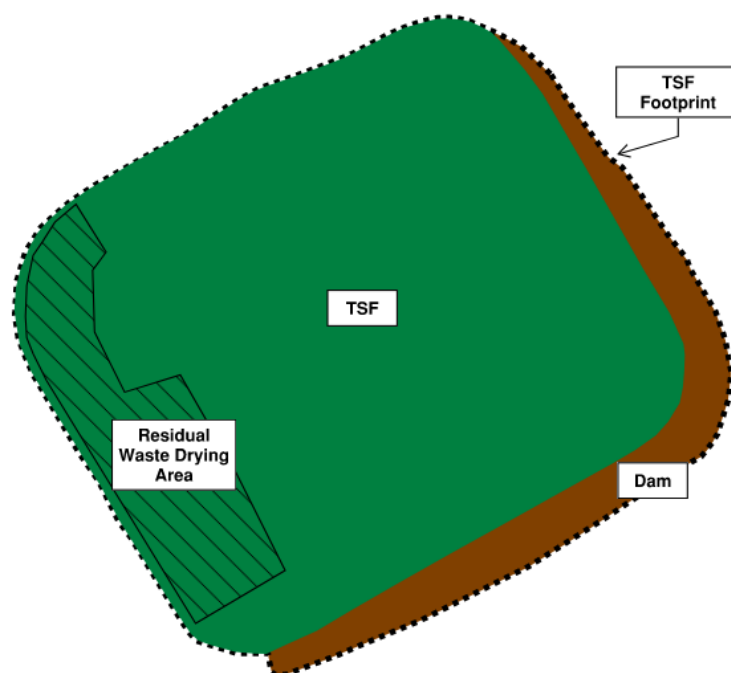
Configuration of the tailings storage facility (TSF) before stage 2 construction
